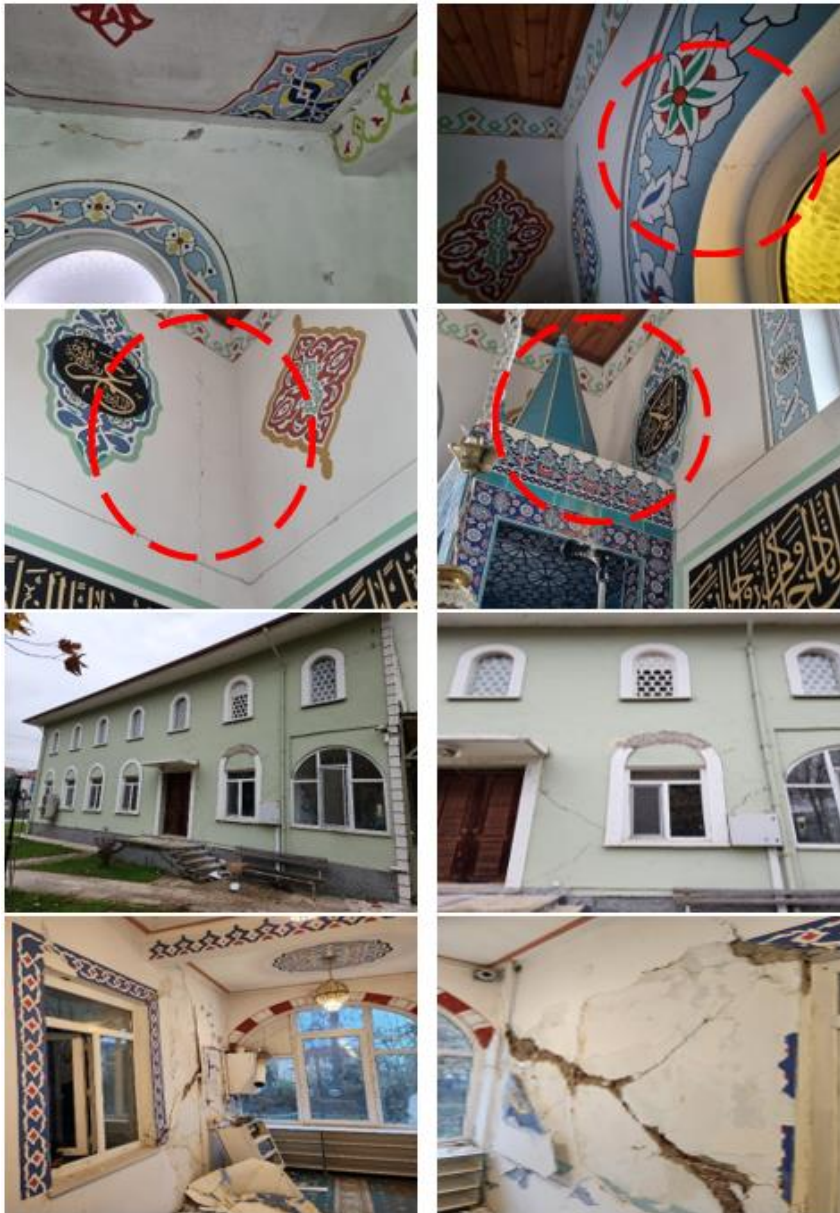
Damages observed in (a) reinforced concrete and (b) masonry mosques
